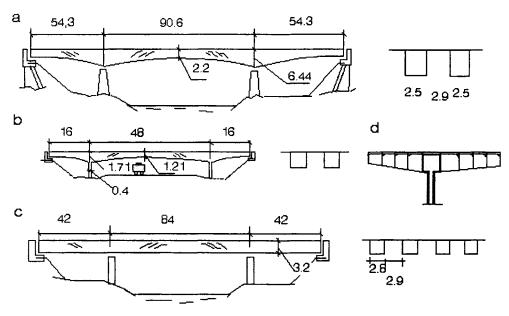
Cracking of prestressed concrete segmental box-girder bridges
